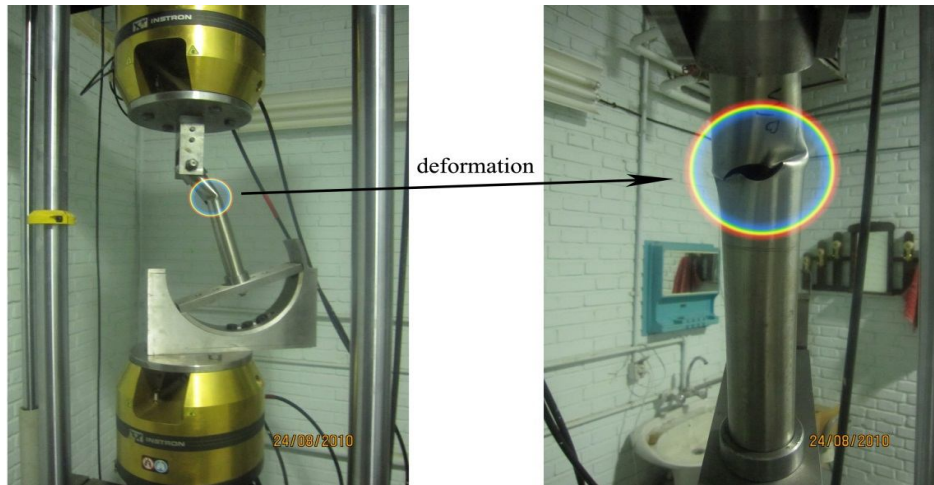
Specimen D42-L250-CP62.5-18 after loading by test setup
